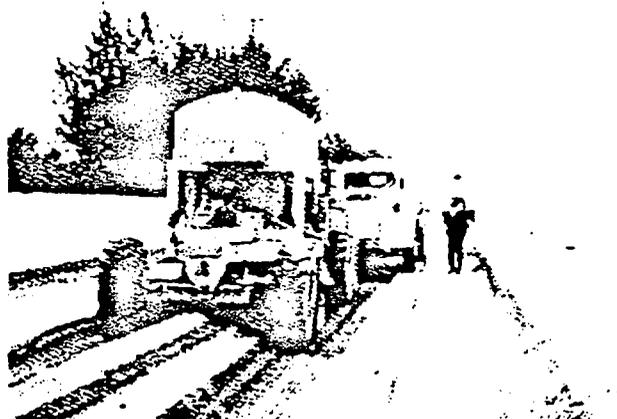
Windrow-type traveling pugmill mixing soil cement from windrows of soil material
